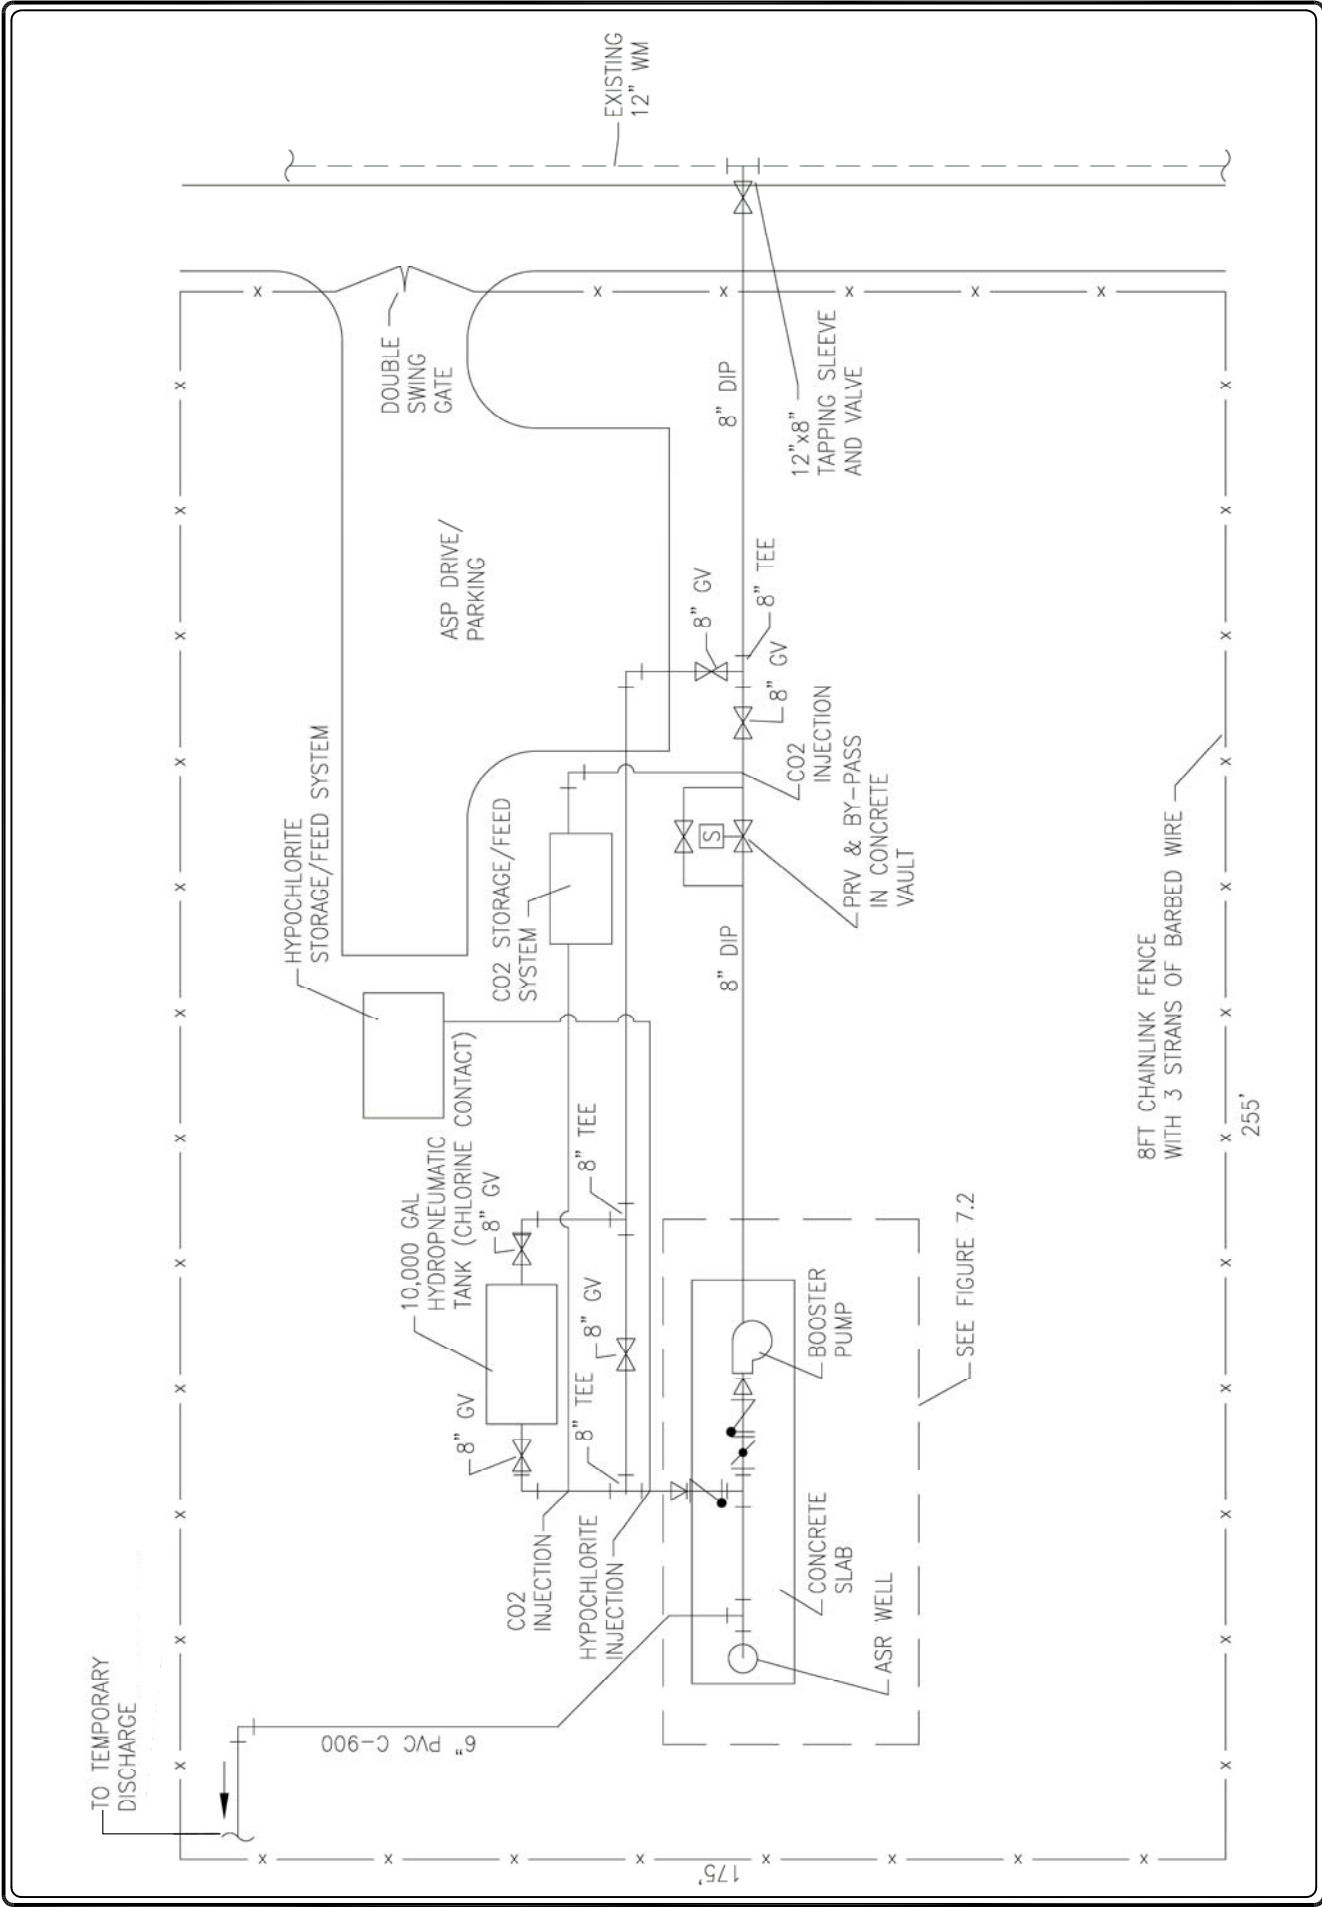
PROPOSED SITE PLAN/LAYOUT WITH YARD PIPING FOR ALTERNATIVE SITES.
